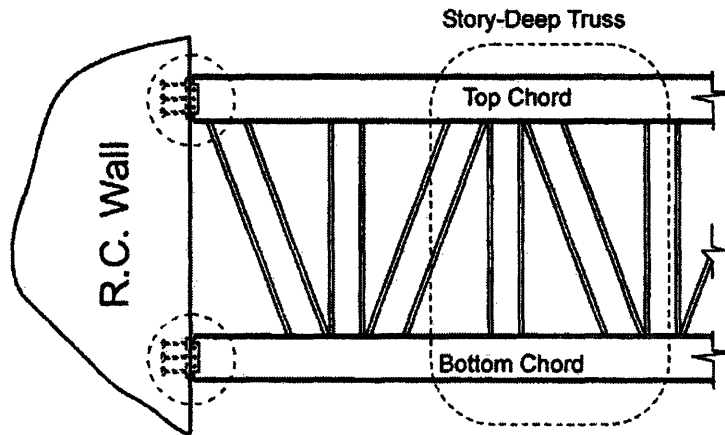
Schematic detail of outrigger truss – core wall connection (Shahrooz, 2004)
